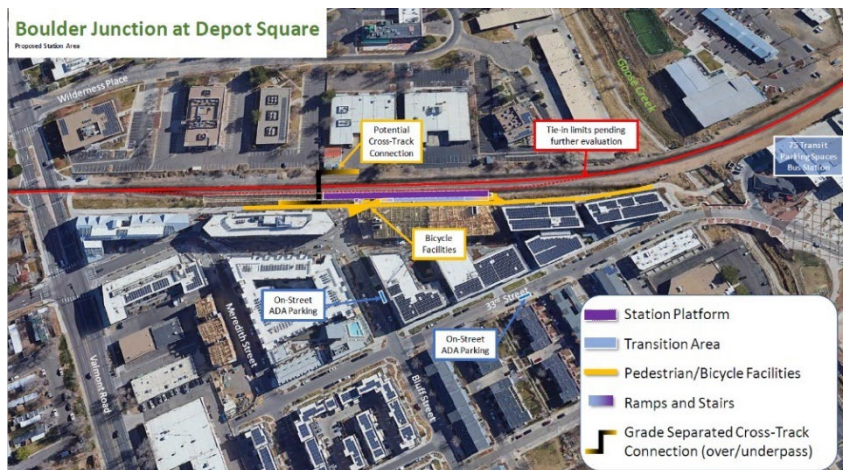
Concept Plan for Boulder Junction Northwest Rail Station
